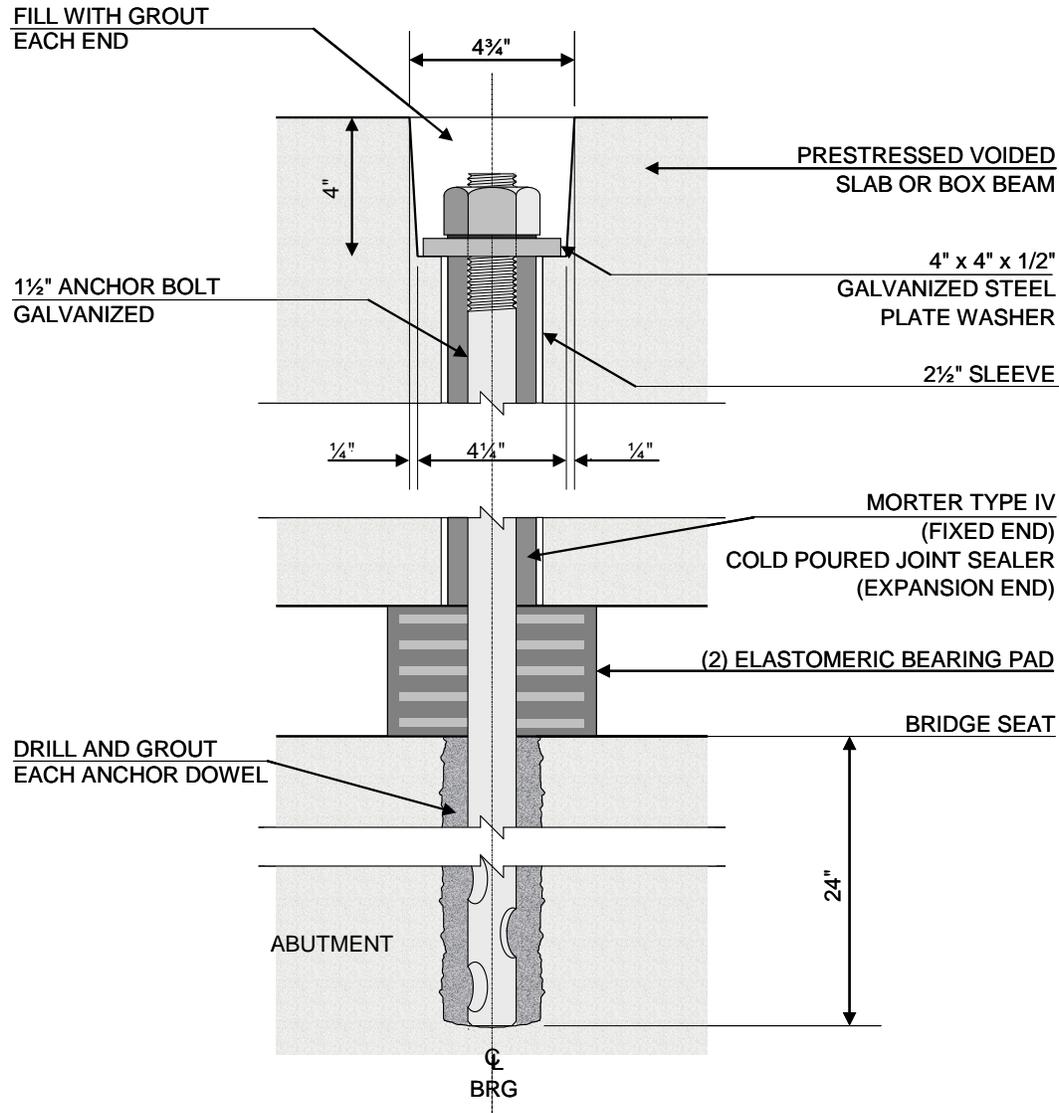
1 Prestress Beam Anchor Detail
